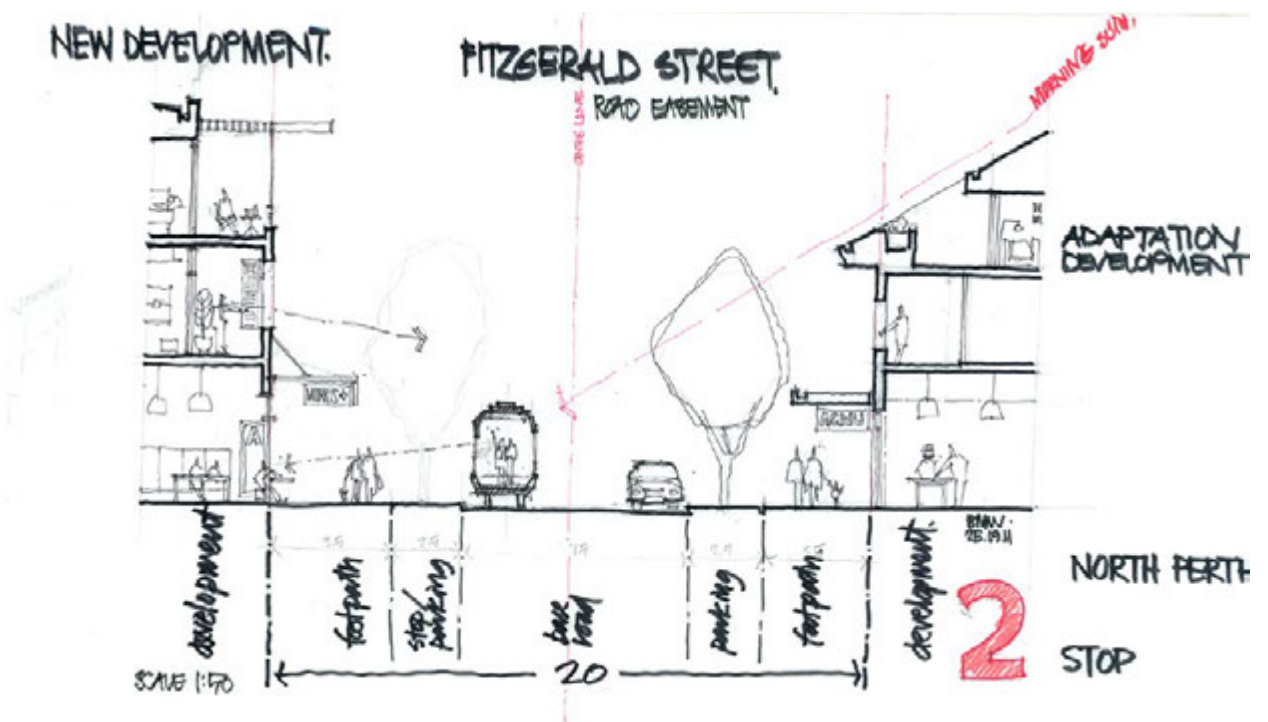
Portal or gateway development proposed, corner Angove Street and Fitzgerald Street – Section
